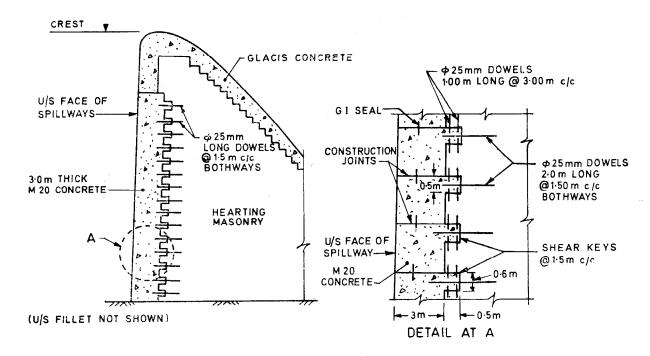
THIN CONCRETE MEMBRANE WITH REINFORCEMENT ON UPSTREAM FACE
